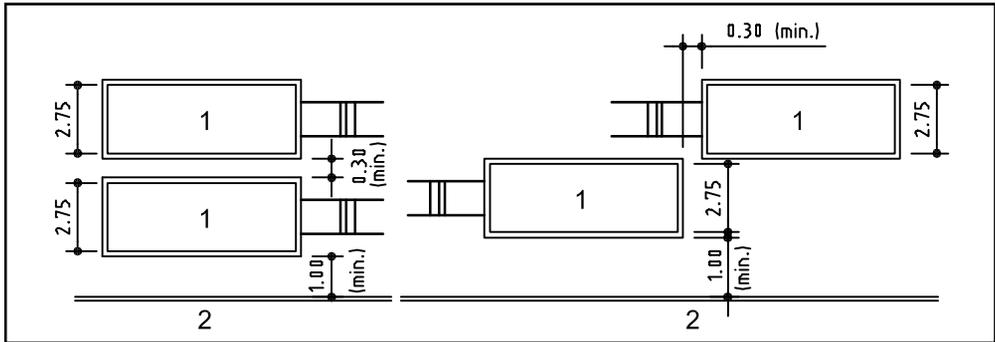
Minimum distance of parallel adjacent long and triple jump facilities
